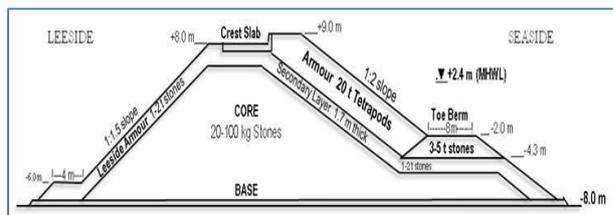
Cross-Section of Breakwater at -8.0 m Bed Level (Section E-E)
